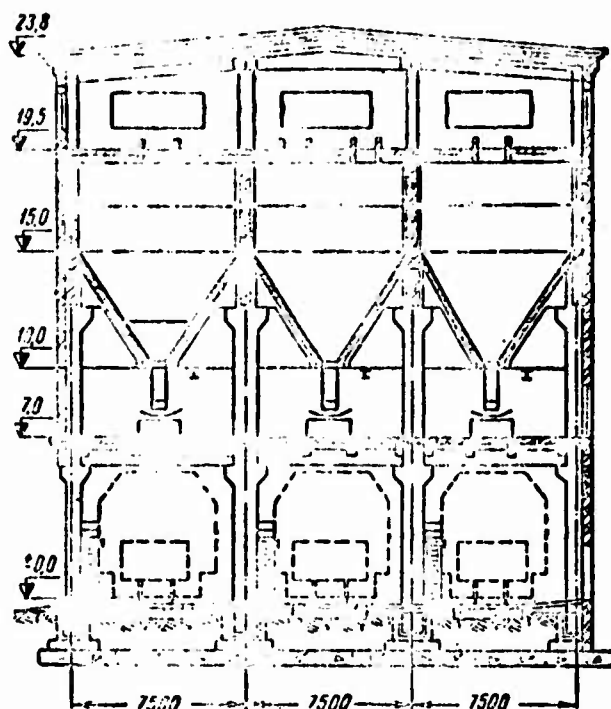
Precast ferroconcrete triple-span loading hoppers.
